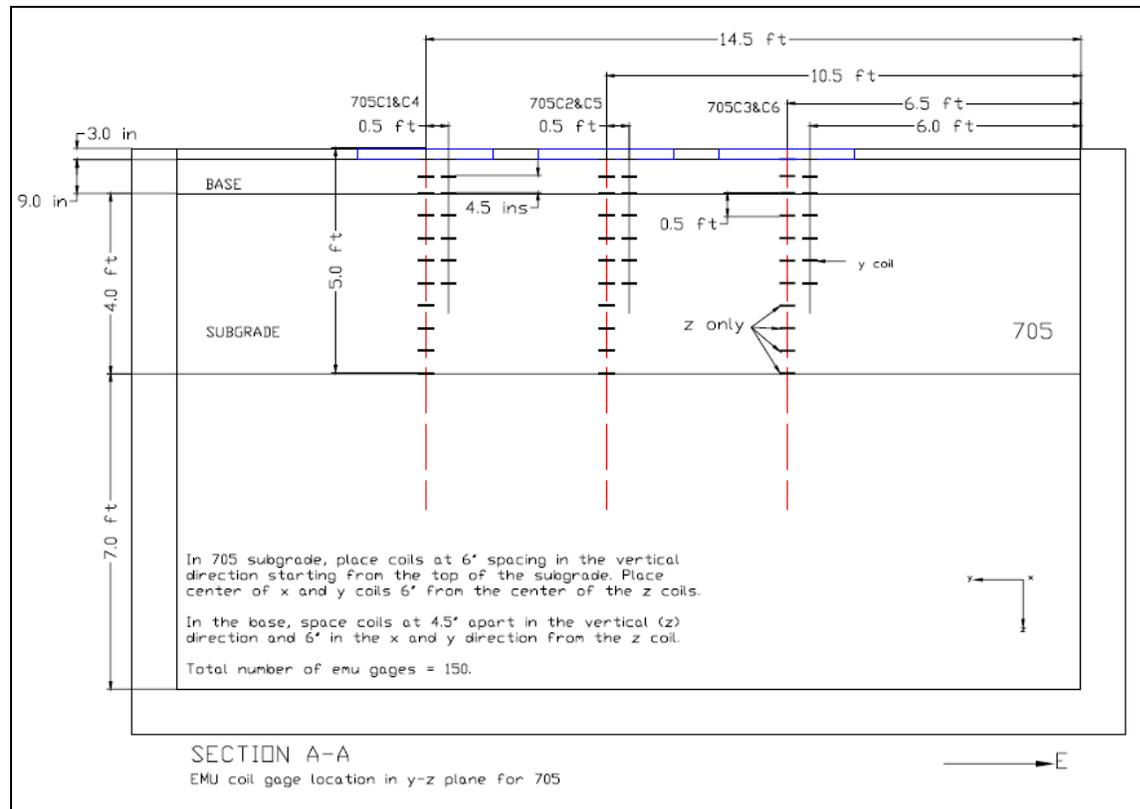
Cross section of test section showing the location of emu sensors (Cortez, 2007)
